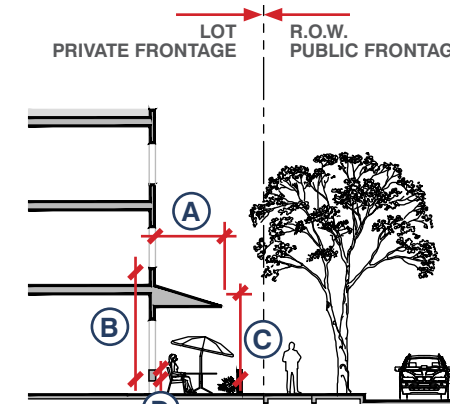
SHOPFRONT FRONTAGE SECTION
